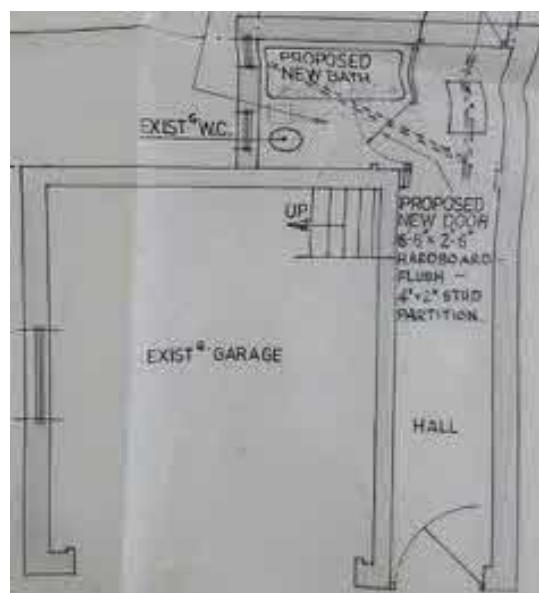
(right): Proposed new bathroom on ground floor of garage/Flat 90B – 1968-70s.
